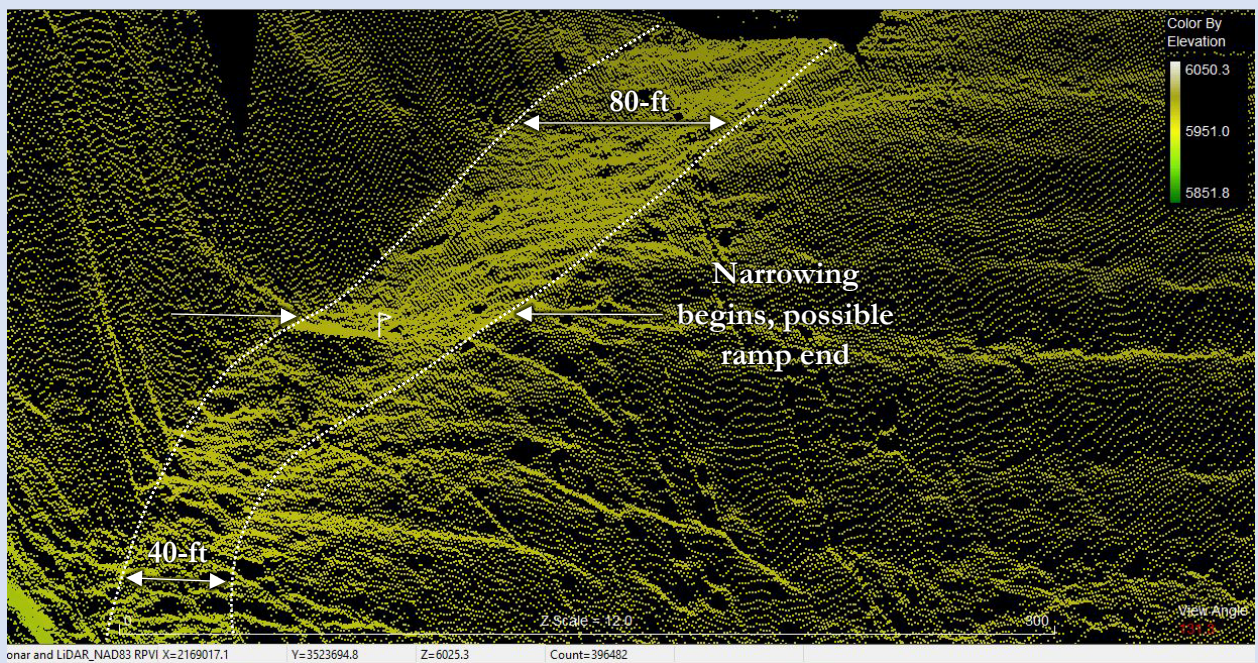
HYPACK cloud imagery looking at narrowing of boat ramp near elevation 5967 feet
